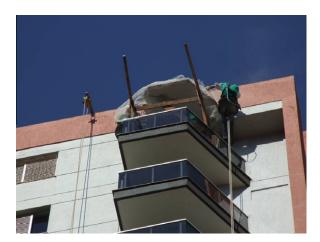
Metal guides installed in the coverage of the building in order to suspend workers using safety belts connected to steel cables.
